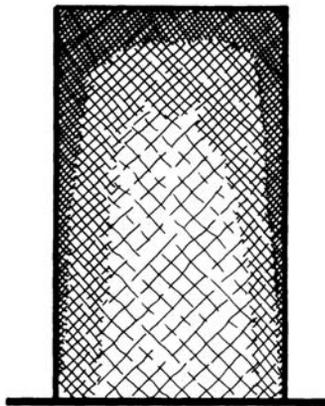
Typical wetting pattern on the face of a multistorey building subjected to wind-driven rain.
